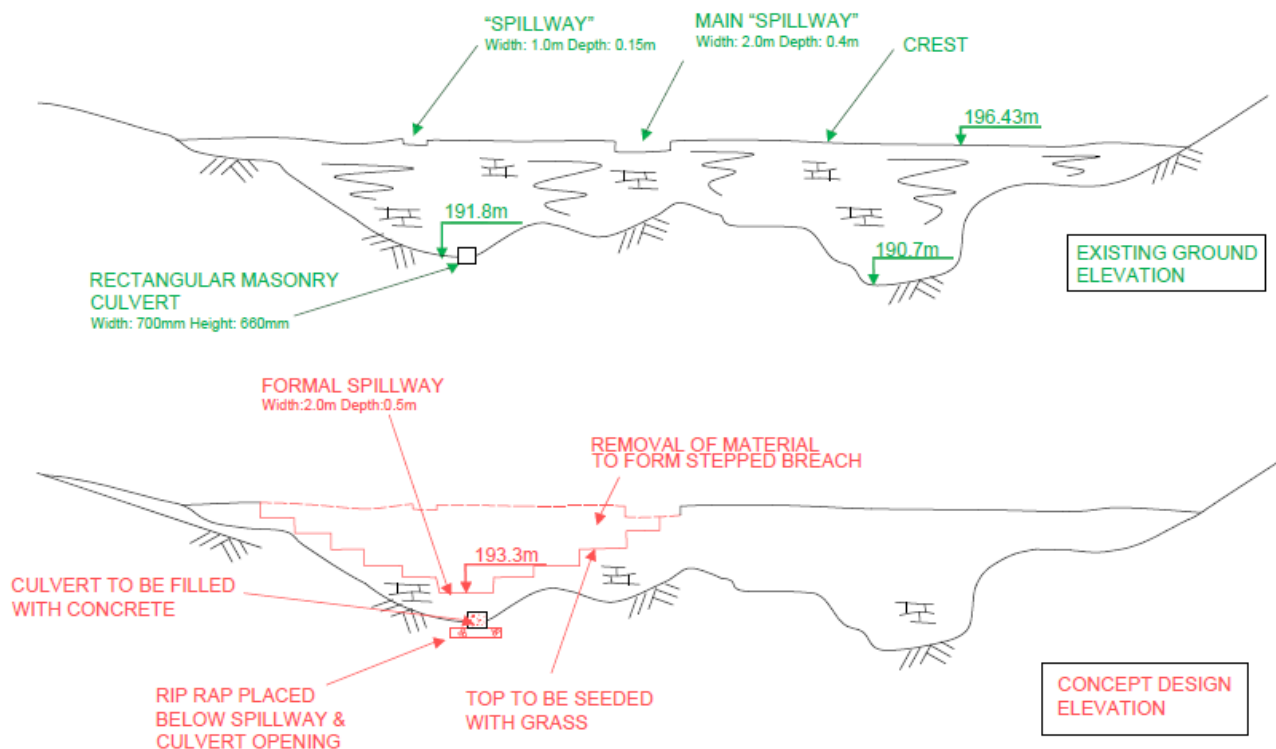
Existing arrangement for Prince Llewelyn dam (above) and the proposed concept design (Adapted from (Arcadis, 2018))
